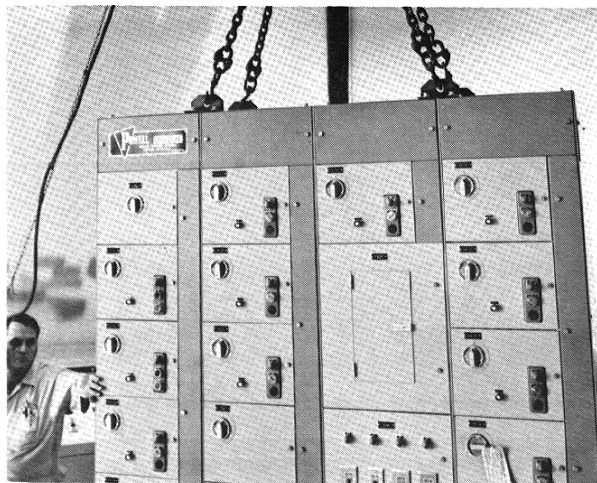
Handling of indoor Motor Control Center with overhead crane.
